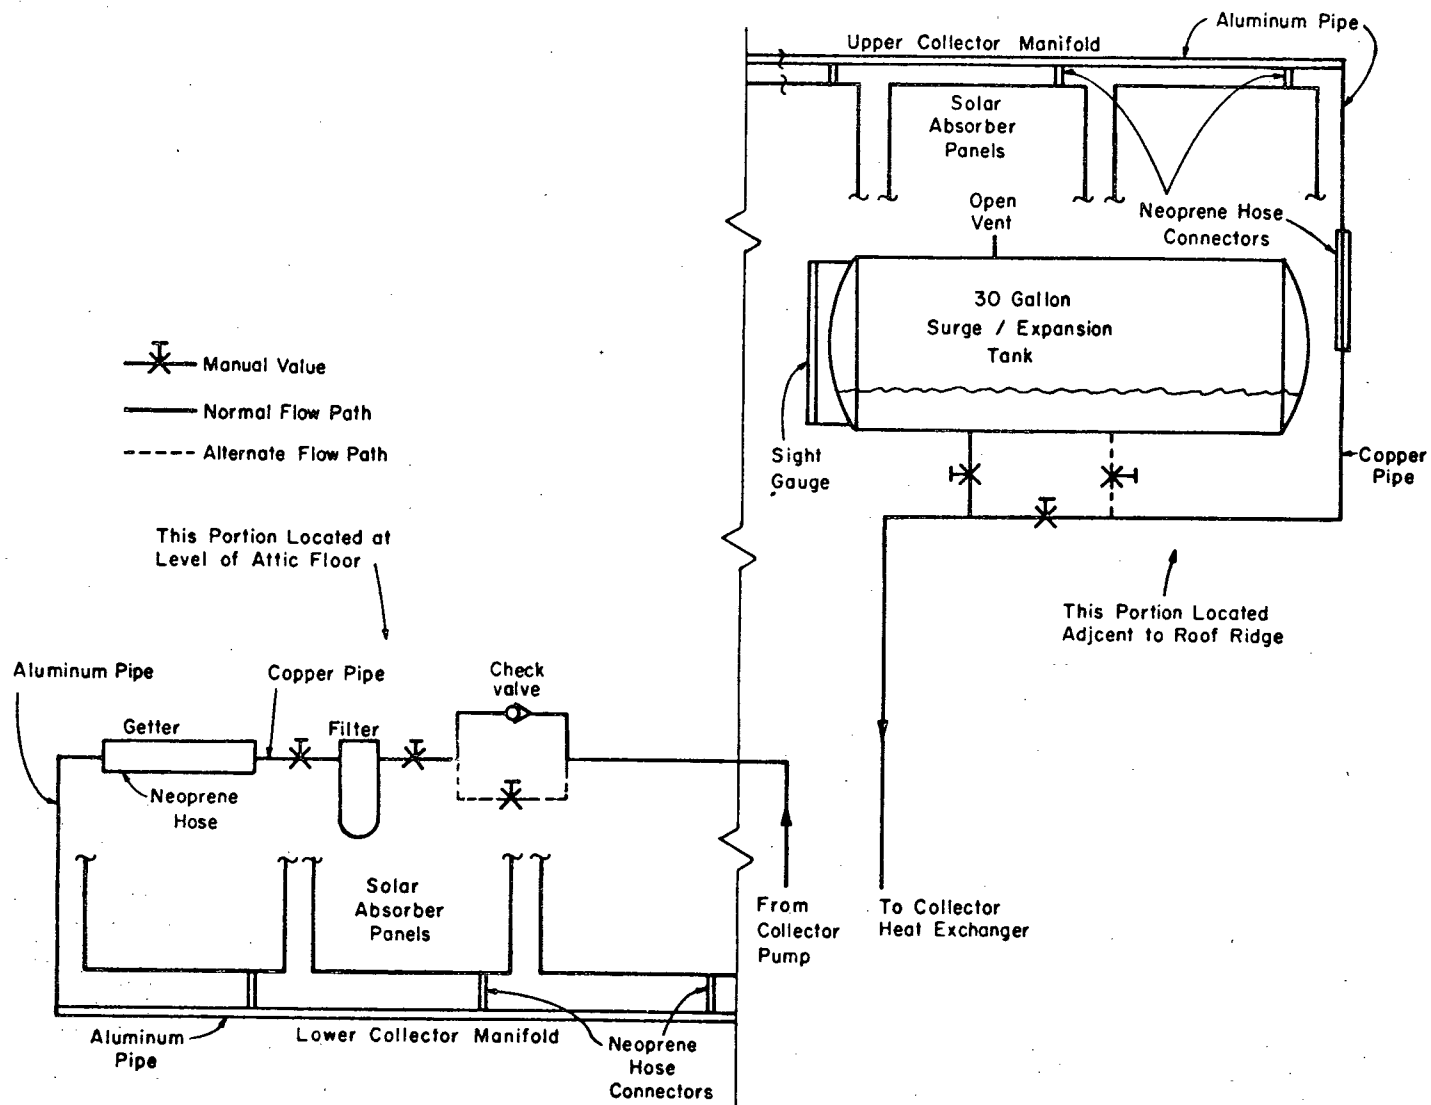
Diagram of Piping at Collector Inlet and Outlet (in attic)
